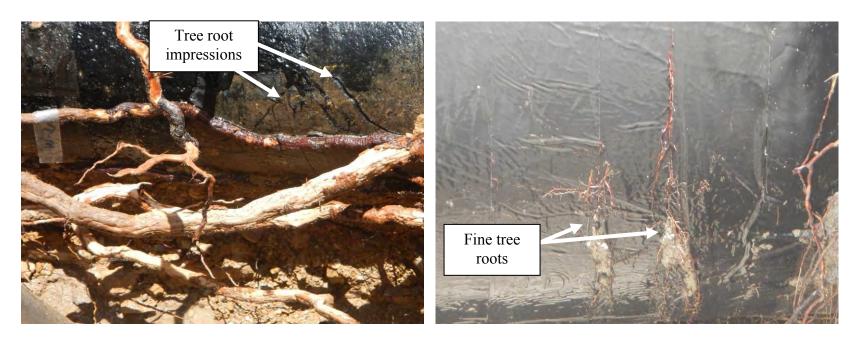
Photographs showing coating damage observed on pipe sections coated with tape.
